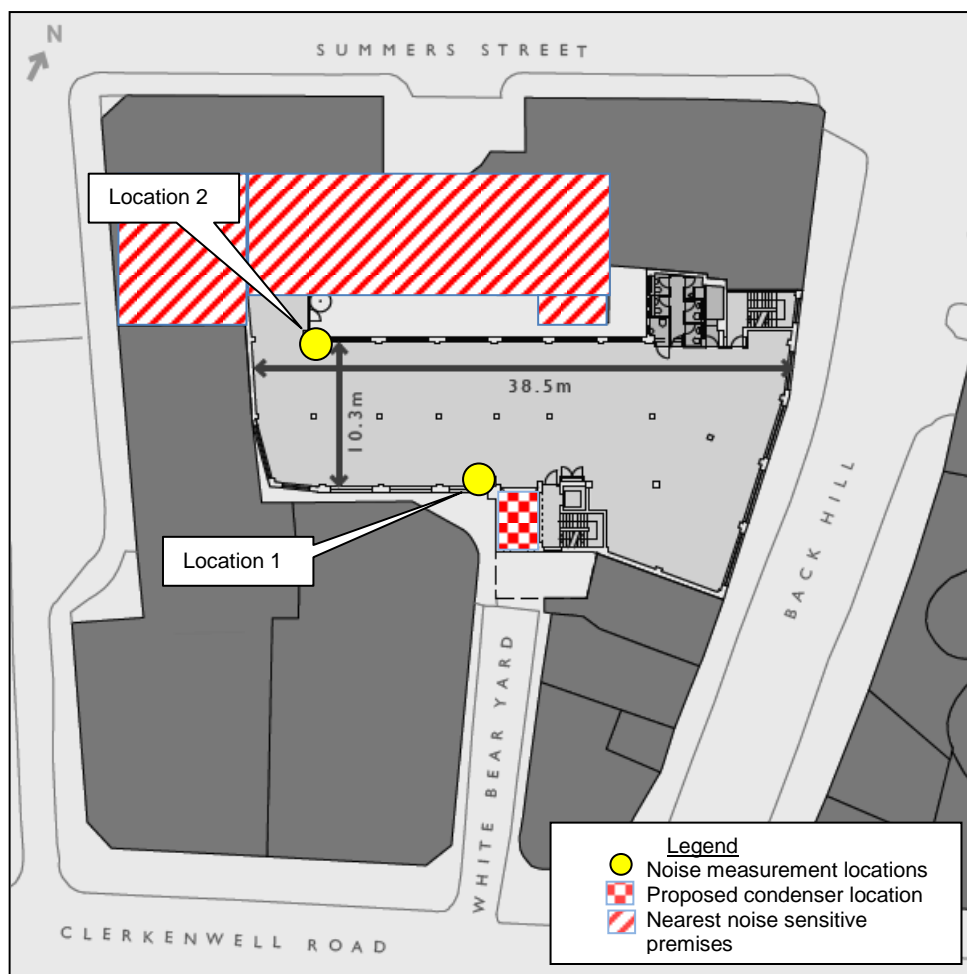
Site Plan Showing Location of Measurement Microphones, NNSP and Proposed Plant Item
